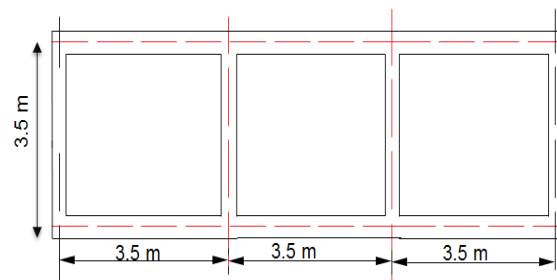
Dimensions of the designed concrete box culvert at Suluq-Mosus road.
